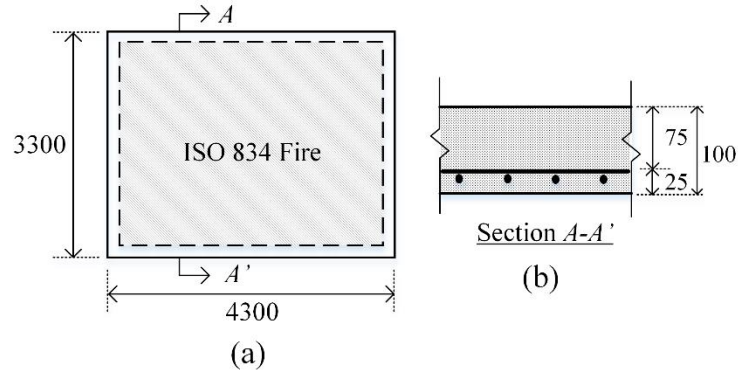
Test configuration of BRANZ fire test [64,65]: (a) floor plan dimensions; (b) cross-section. All dimensions in [mm].
